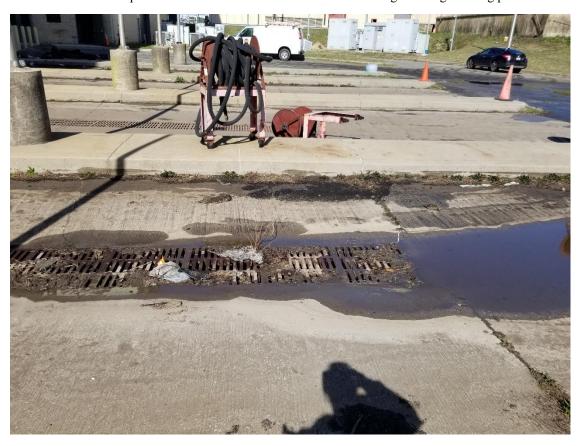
South-east of the dried sludge loading building, some of the flow water was observed to be flowing to a stormwater management culvert.
